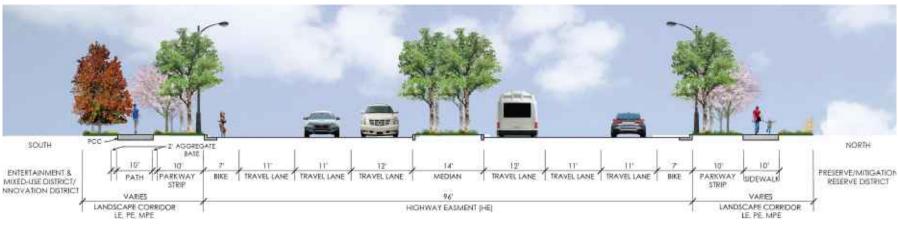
Athens Avenue - Section A, 6-Lane Arterial, adjacent to Entertainment & Mixed-Use/Innovation Districts
